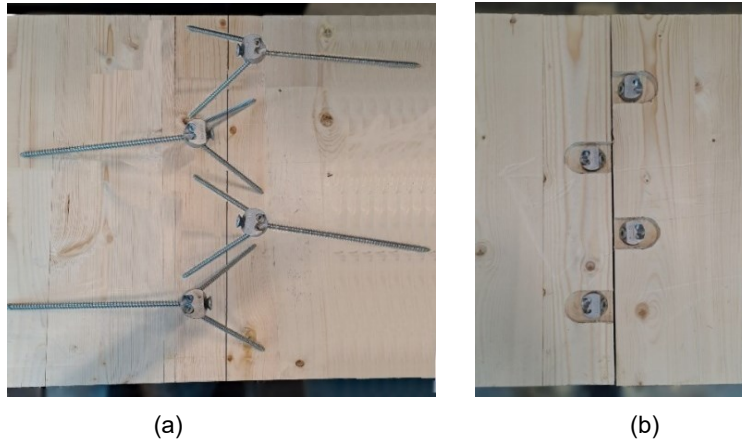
T-joint: (a) layout before installation, (b) fully installed
